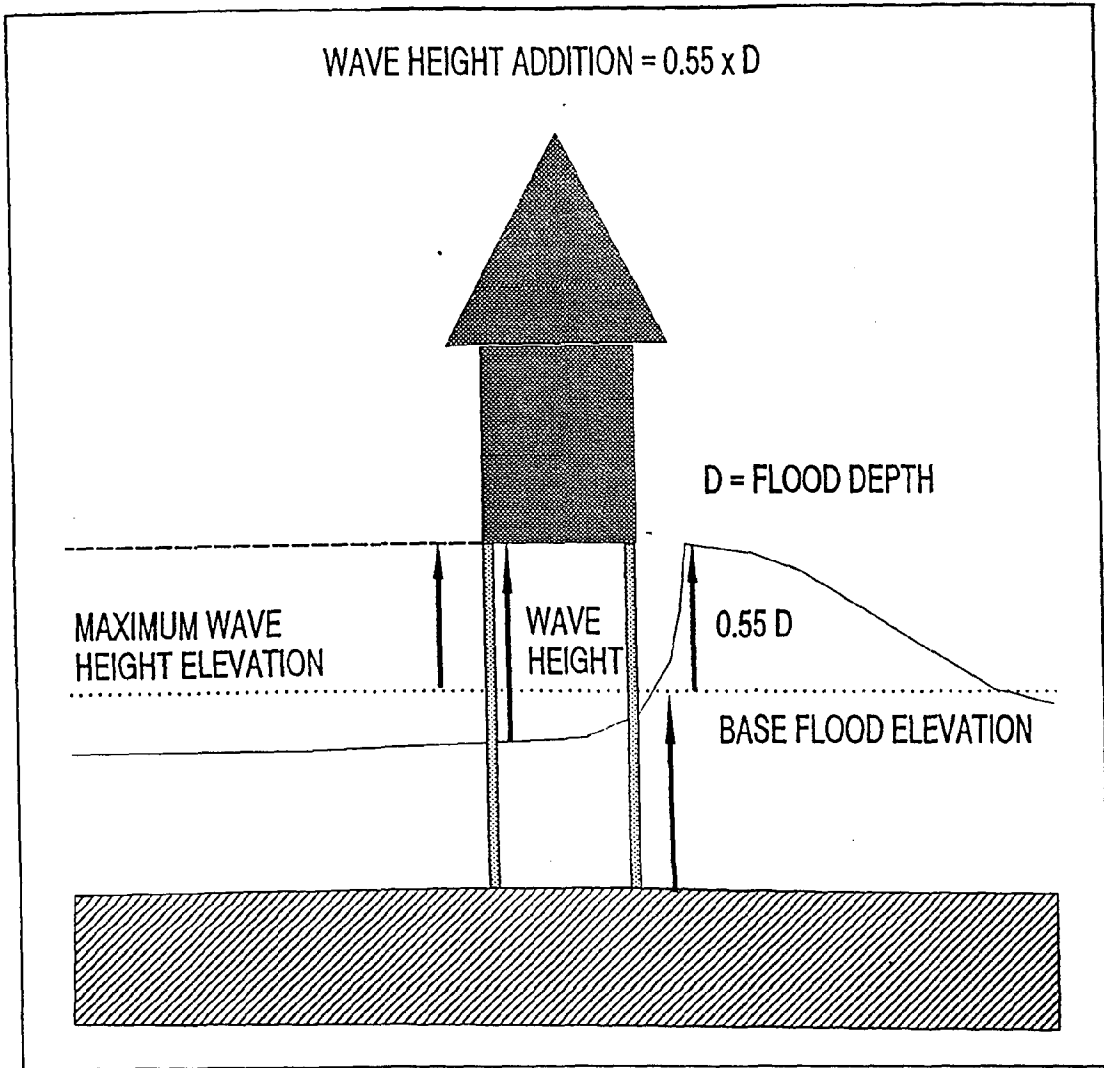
WAVE CONDITIONS ON A PILING SUPPORTED BUILDING
